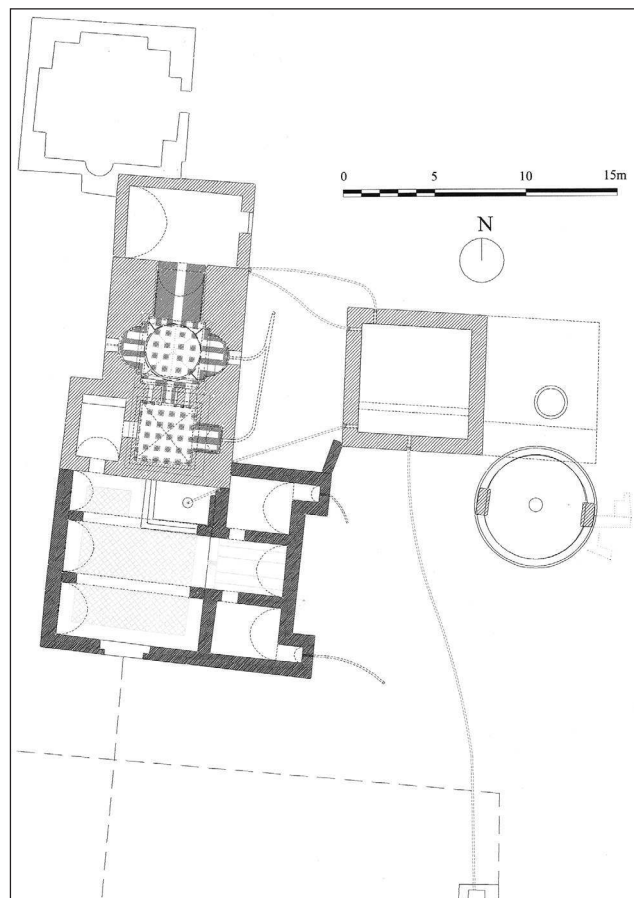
Hammam al-Sarah. Detailed plan of the building, the hydraulic system, and the late mosque
